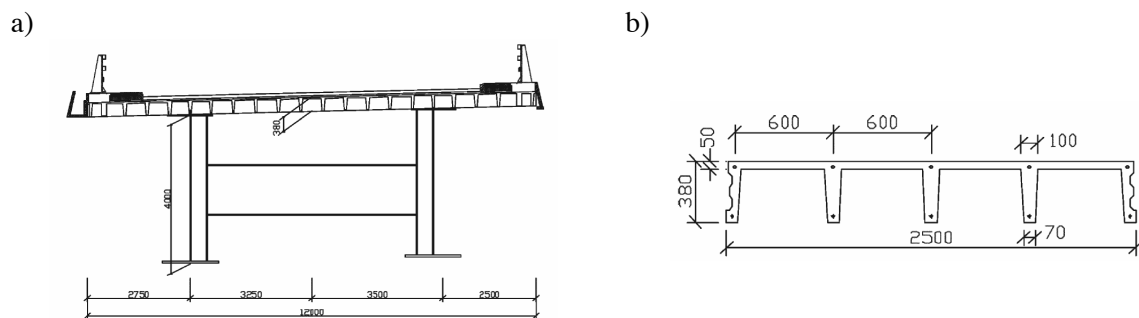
a) cross section of road bridge pilot project with UHPFRC ribbed deck slab; b) repetitive element of ribbed deck slab; [Toutlemonde et al. 2005]
